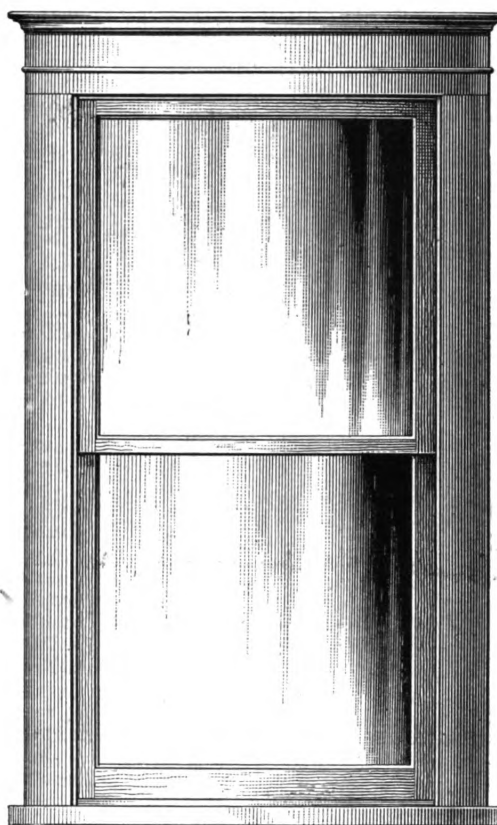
Elevation of Frame and Sash.—Scale, $\frac{3}{4}$ inch to the Foot.
